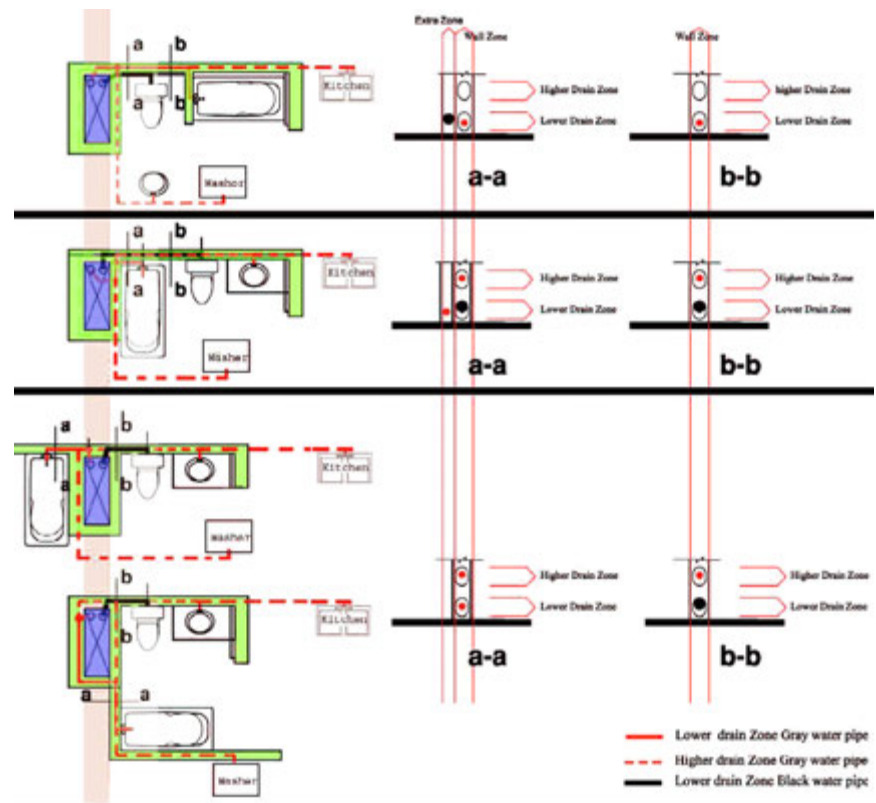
Arrangement of piping systems according to Kendall (2005)
